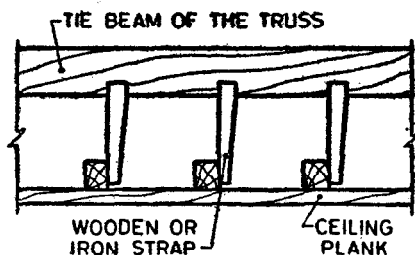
CLOSED CEILING JOISTS AND PLANKS
